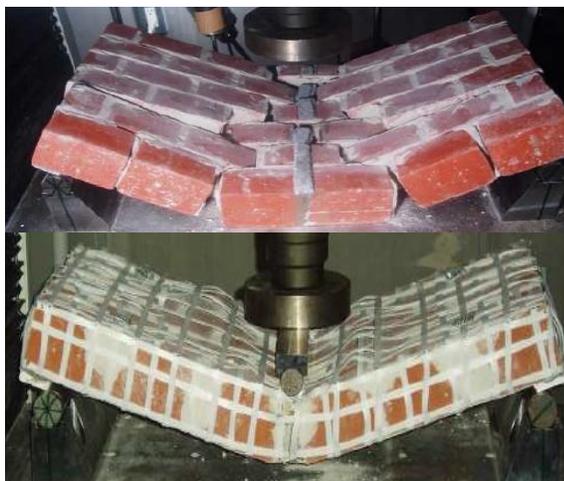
Failure patterns of brick masonry wallets with and without retrofitting by PPB mesh and the out-of-plane load variation [7.5]
